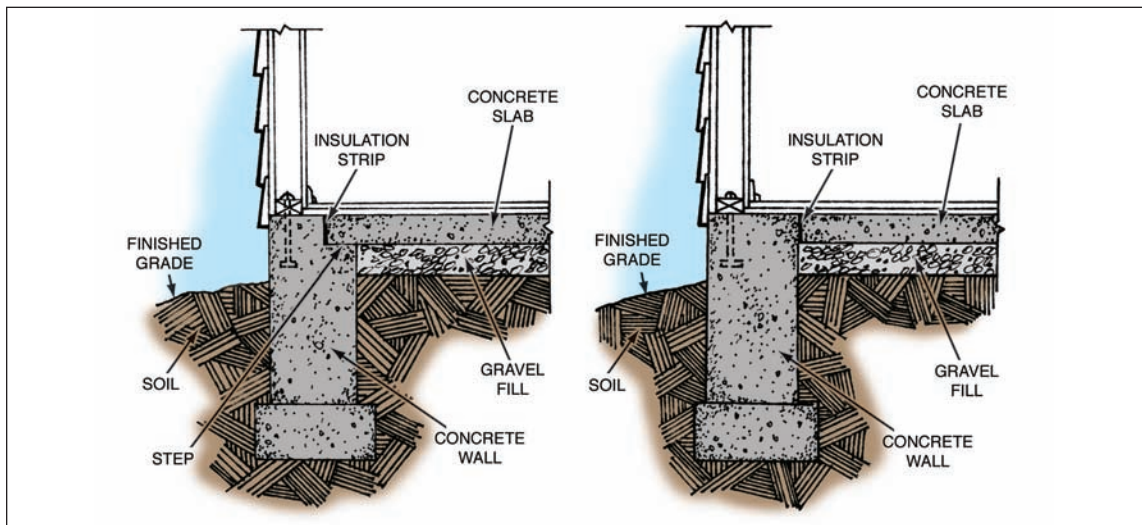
Slab-on-ground construction (floating slab): (above, left) slab suspended on foundation wall; (above, right) slab rests entirely on ground.
